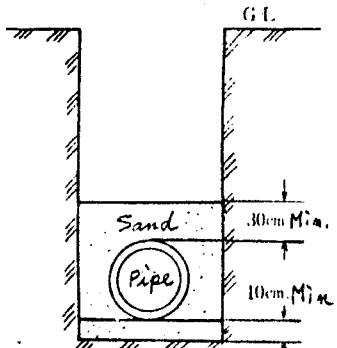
FOOTING FOR PIPE ON GOOD QUALITY GROUND
